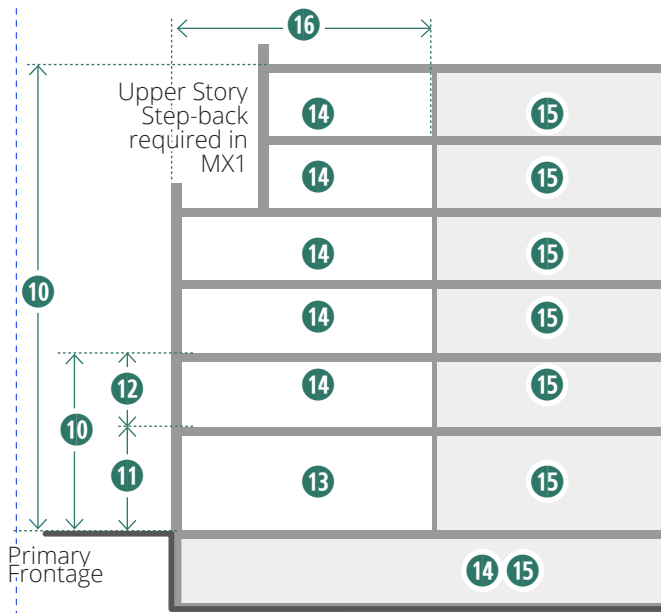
(8) Storefront Building Section: Height & Use Requirements
